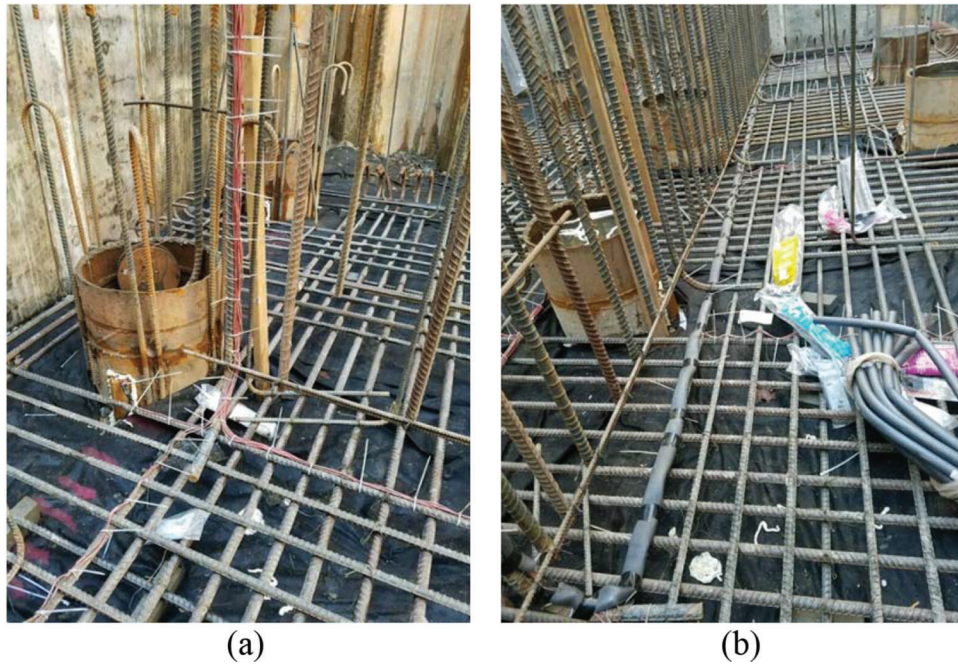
shows the locations of the sensors installed in the bridge pier and on the pile heads, as well as the arrangement of the cables for these sensors. The cables for the arc-weldable strain gauges installed at the pile heads were collected from the top of the pile cap and then merged with the cables from the other sensors (sister-bar type and concrete-embedded type) installed in the bridge pier. All the cables were organized along the vertical rebars in the bridge pier, exiting at the top of the hammer-head pier cap for data collection. To date, more than 2 years have passed since the installation of the sensors. All sensors are working perfectly well due to the careful installation procedures followed and protection measures taken during the instrumentation work.
